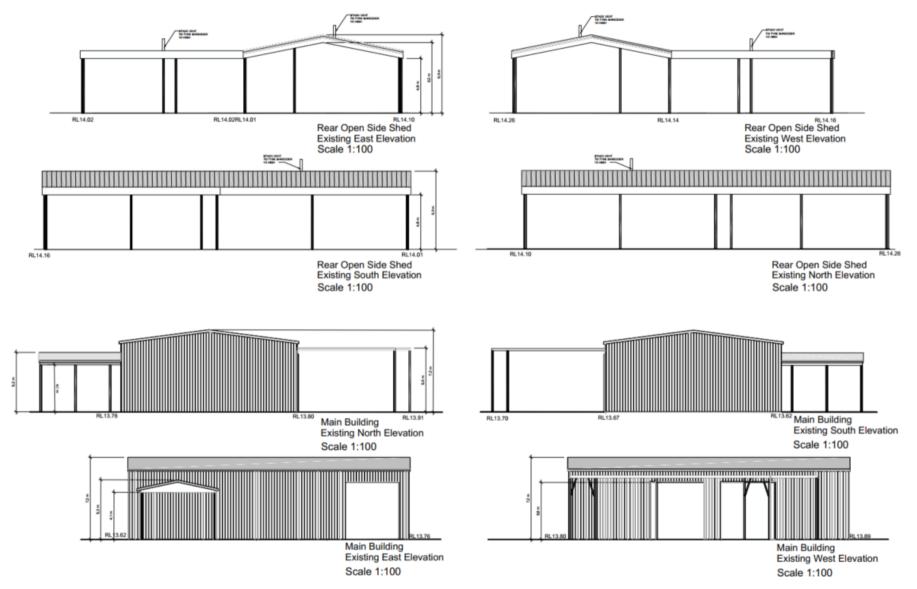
Alteration, Additions and Expansion of an Existing Building
